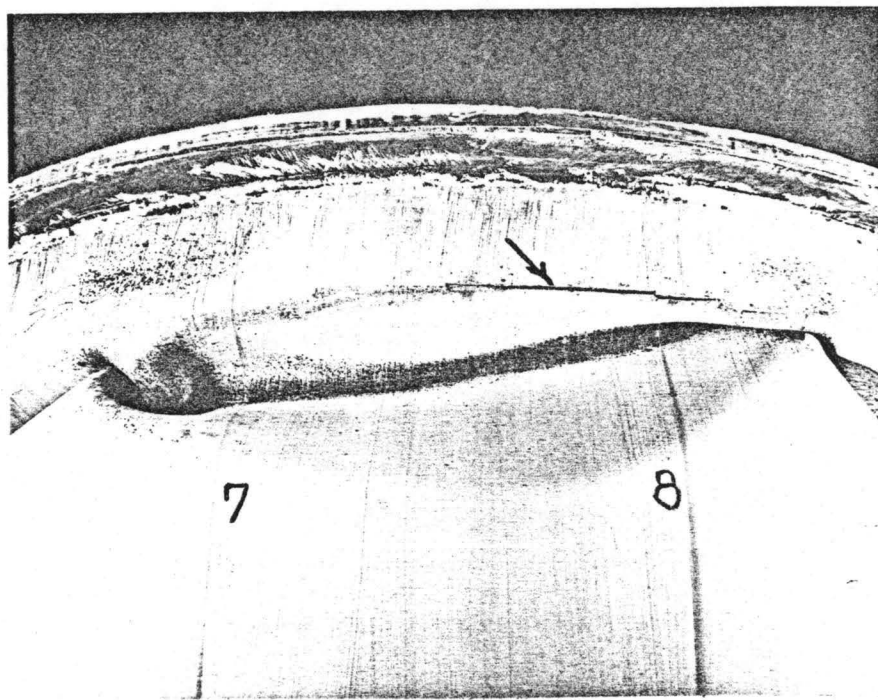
Crack in the Wall of Specimen P9 adjacent to Inclined Surface of the Buckle
